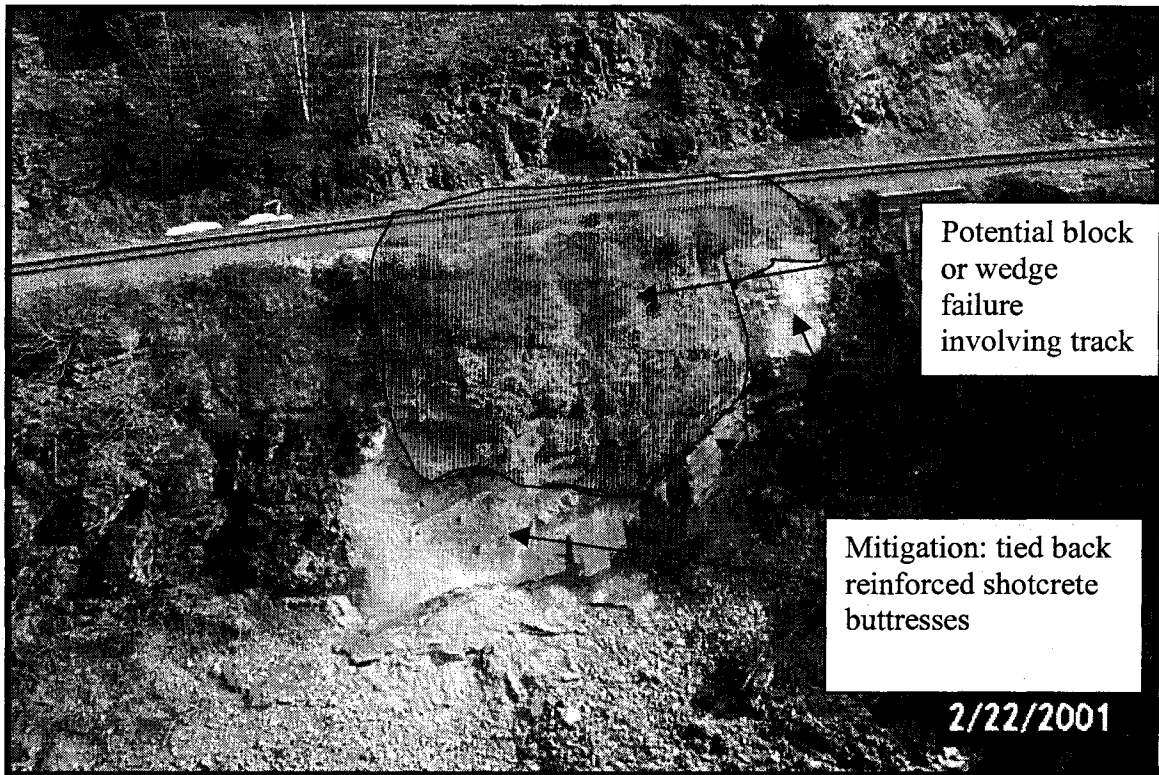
Mitigated rockslide hazard that threatened to undermine track structure at Mile 16.4 CN Yale Subdivision (Photo by Tim Keegan, ref CN File 4670-YLE-16.7)
